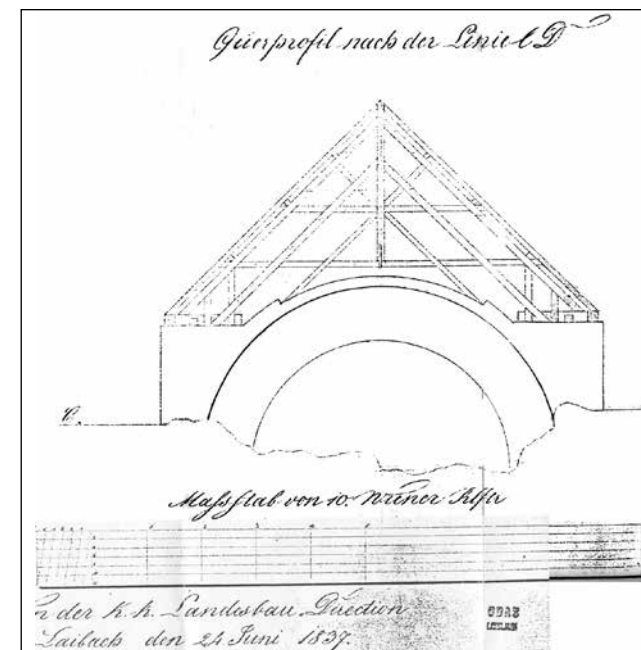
A drawing of the roofing from 1837 (Archives of the Republic of Slovenia).
